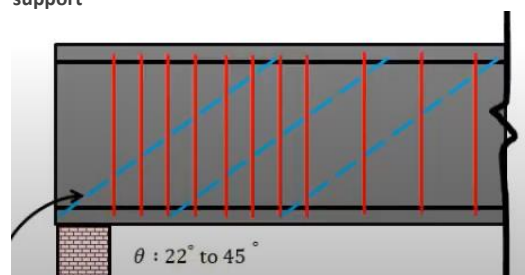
Concrete strut (blue dotted line) resisting shear in compression.
